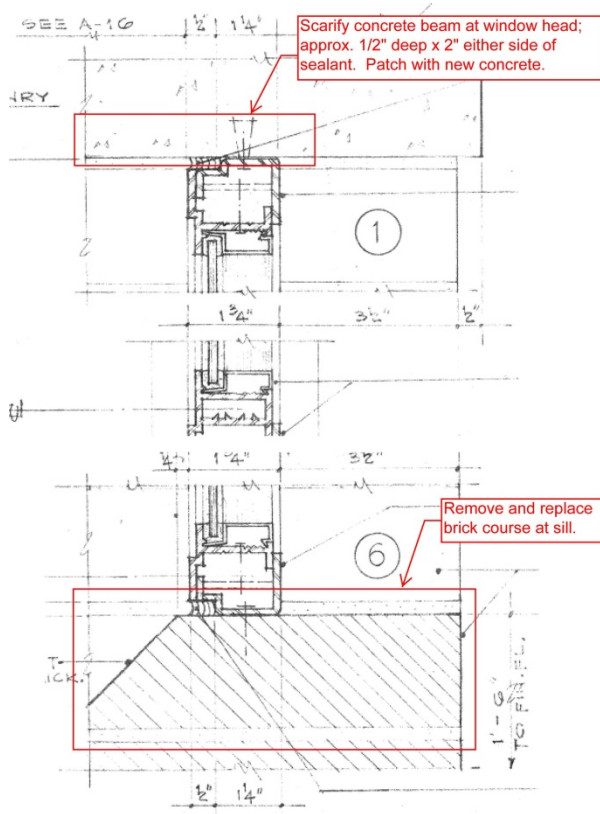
Vertical details at Type 'B' windows indicating PCB Remediation Wastes to be removed. [From 1968 Drawing A-20]
